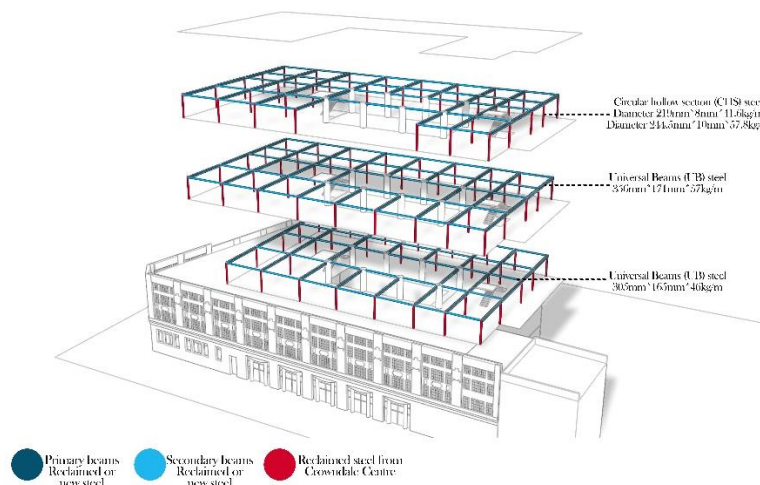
Reclaimed Structural steel design in Crowndale Centre extension (Author)
